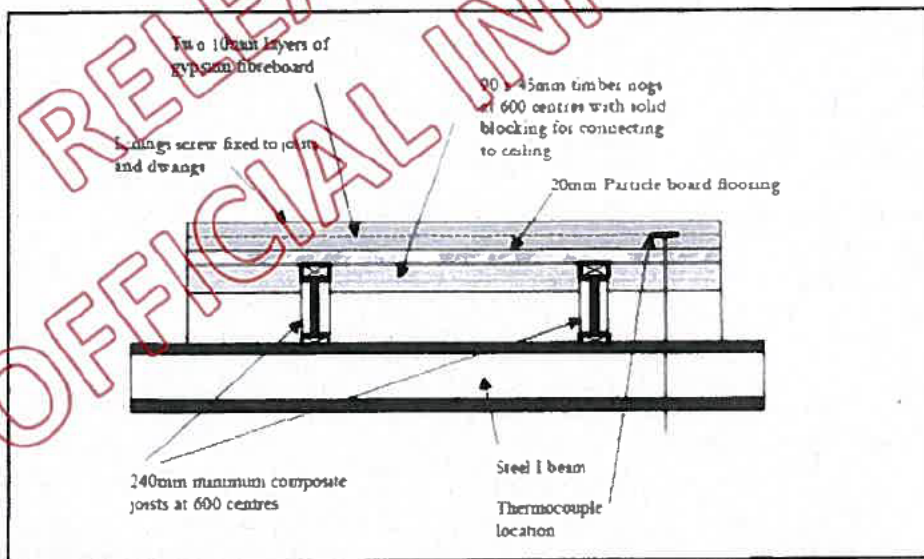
Compartment Floor Cross Section in Natural Fire Tests (from (Nyman 2002))
